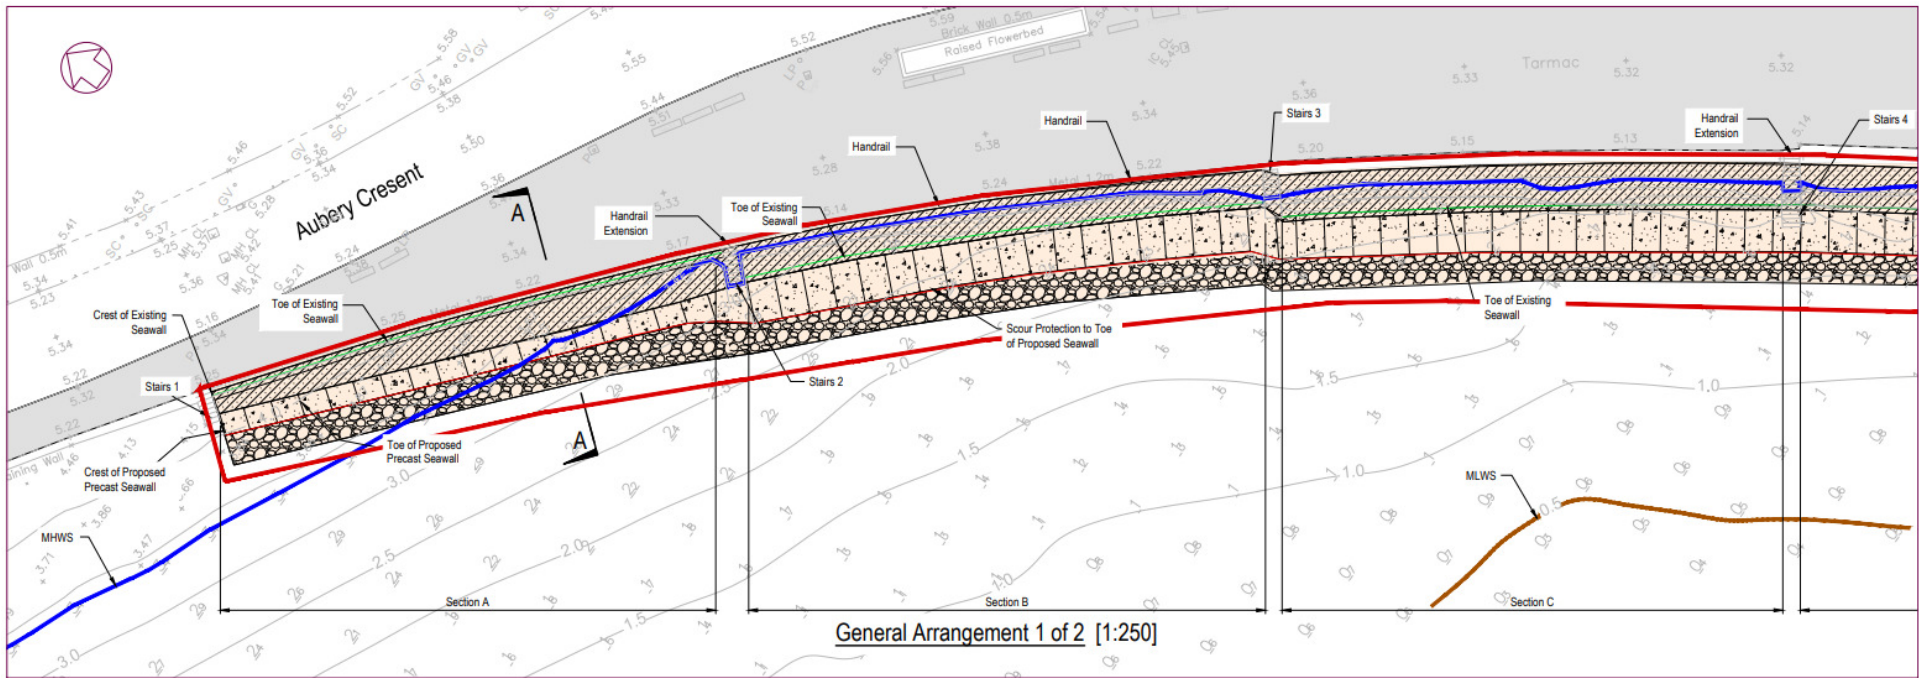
Proposed Seawall Replacement Works General Arrangement (South)
